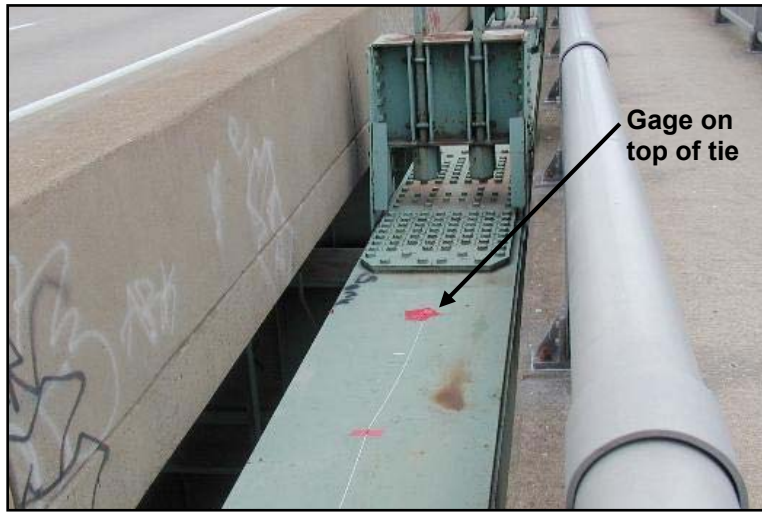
Photograph of gage installed on the top flange of the downstream tie girder adjacent to the center hanger
